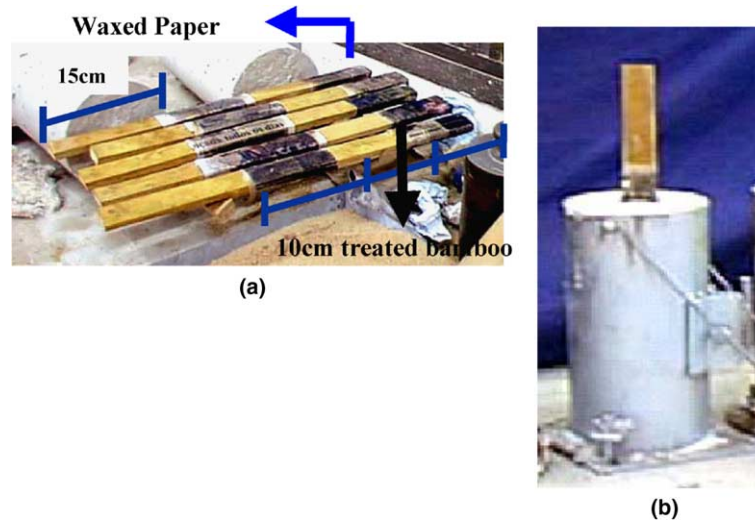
Pull-out tests on untreated and treated bamboo segments. (a) 3 cm bamboo segments. (b) Test specimen before testing.
